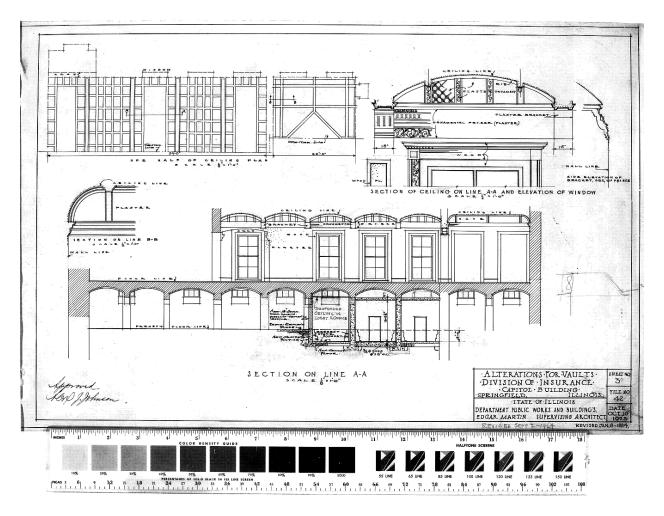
Section and reflected ceiling plan of Illinois Capitol, First floor, northeast corner: Drawing shows "...alterations for vaults..." for the Division of Insurance, including a building section facing east and a partial reflected ceiling plan for proposed modifications, dated October 10, 1923. This drawing shows repairs to the first floor plaster ceiling and cornice that date from the era of W.W. Boyington's designs for the first floor during the 1880s.
